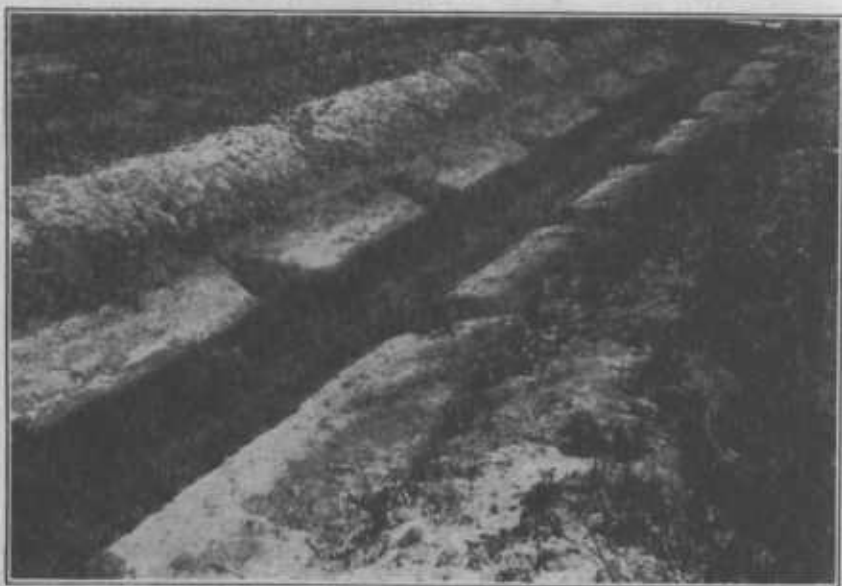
A constructed-terrace outlet with the slightly lowered center sodded and the remainder seeded with a mixture of grasses.
